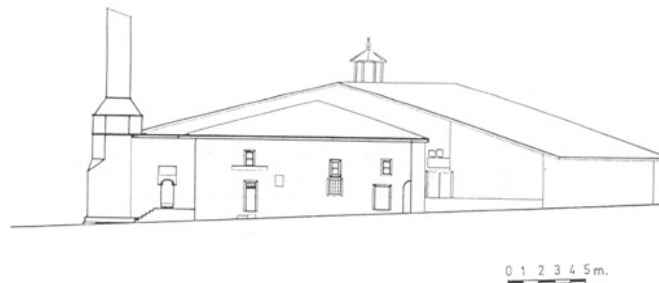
Eastern Wall (Altınsapan, 1999: Drawing 3)
